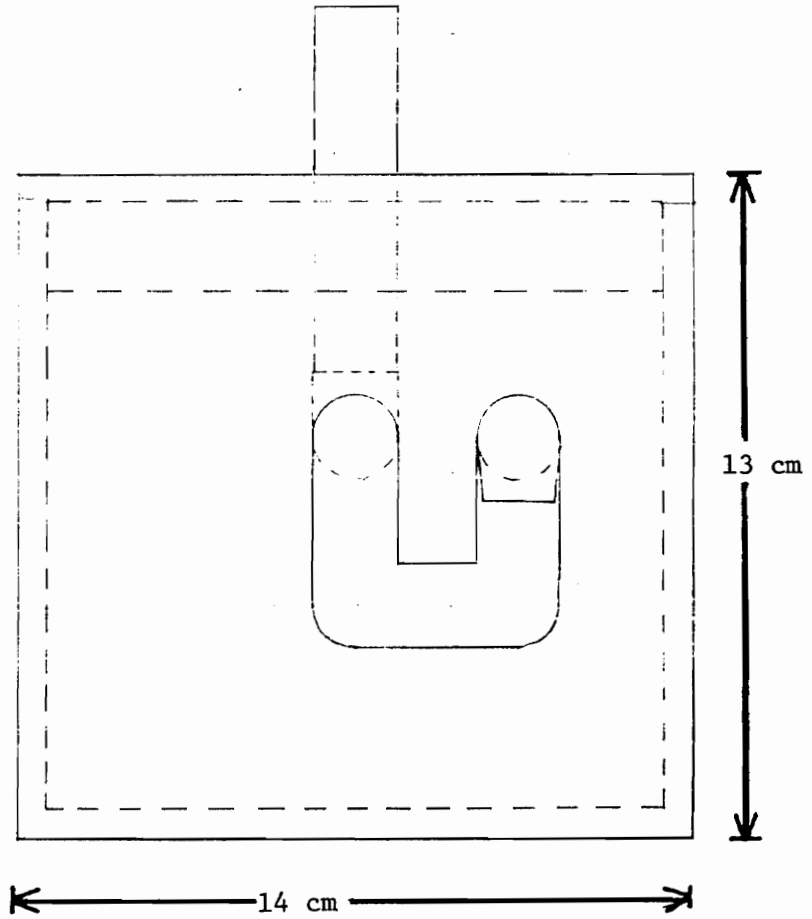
Detail of a Laboratory Scale Septic Tank, End View.
